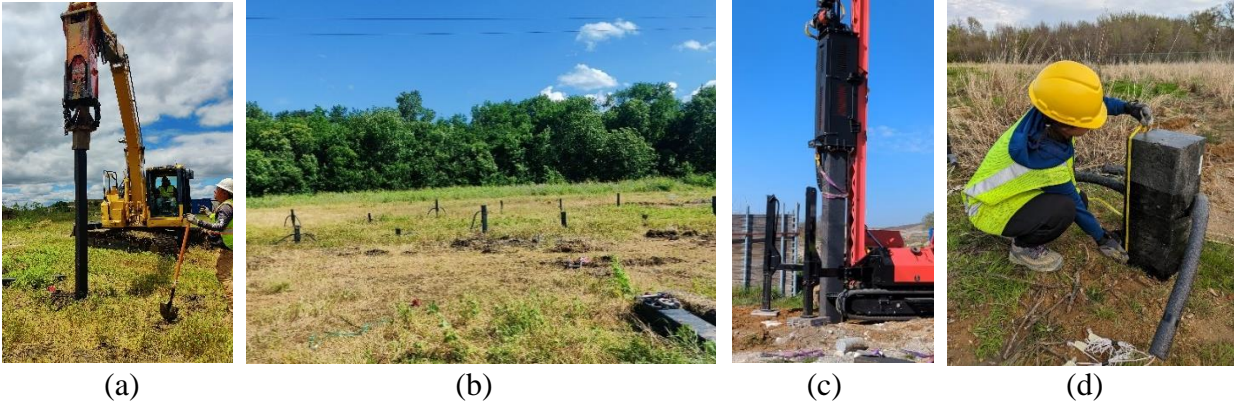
(a) RPP installation using hydraulic excavator; (b) 10 cm x 10 cm RPP and 15 cm x 15 cm RPP after installation (c) RPP Installation with Stroimatic Pile Driver; (d) 25 cm x 25 cm RPP after Installation
